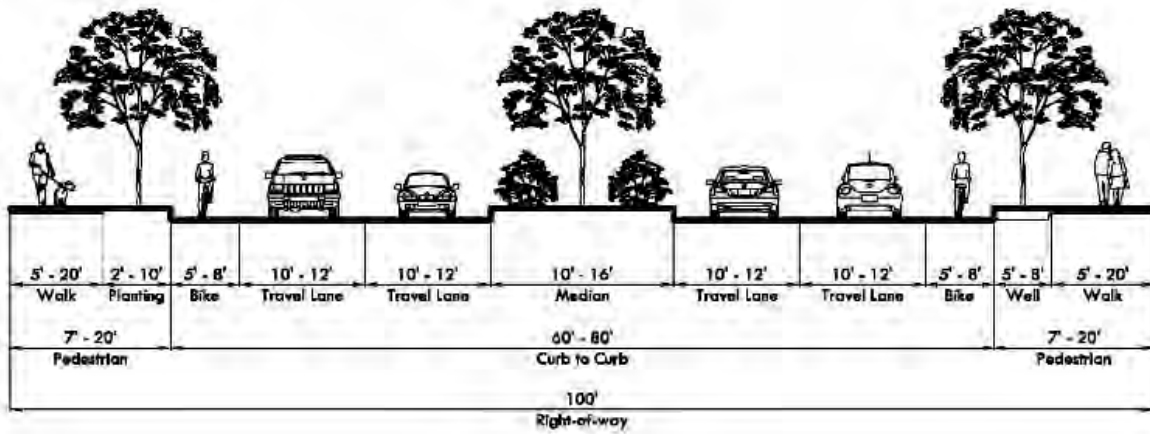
Typical "A" Street with 90'-100' Right-of-Way Section
